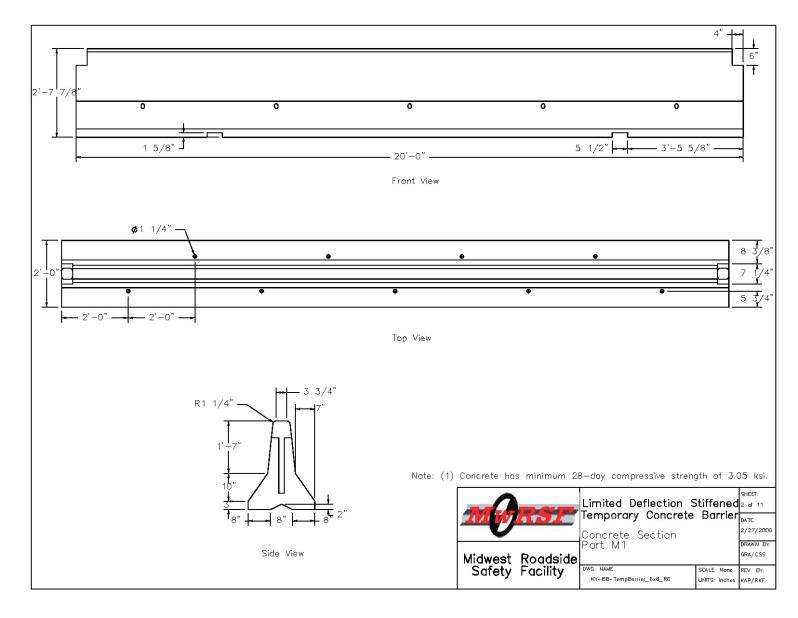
Temporary Concrete Barrier Details (English), Test NYTCB-3
